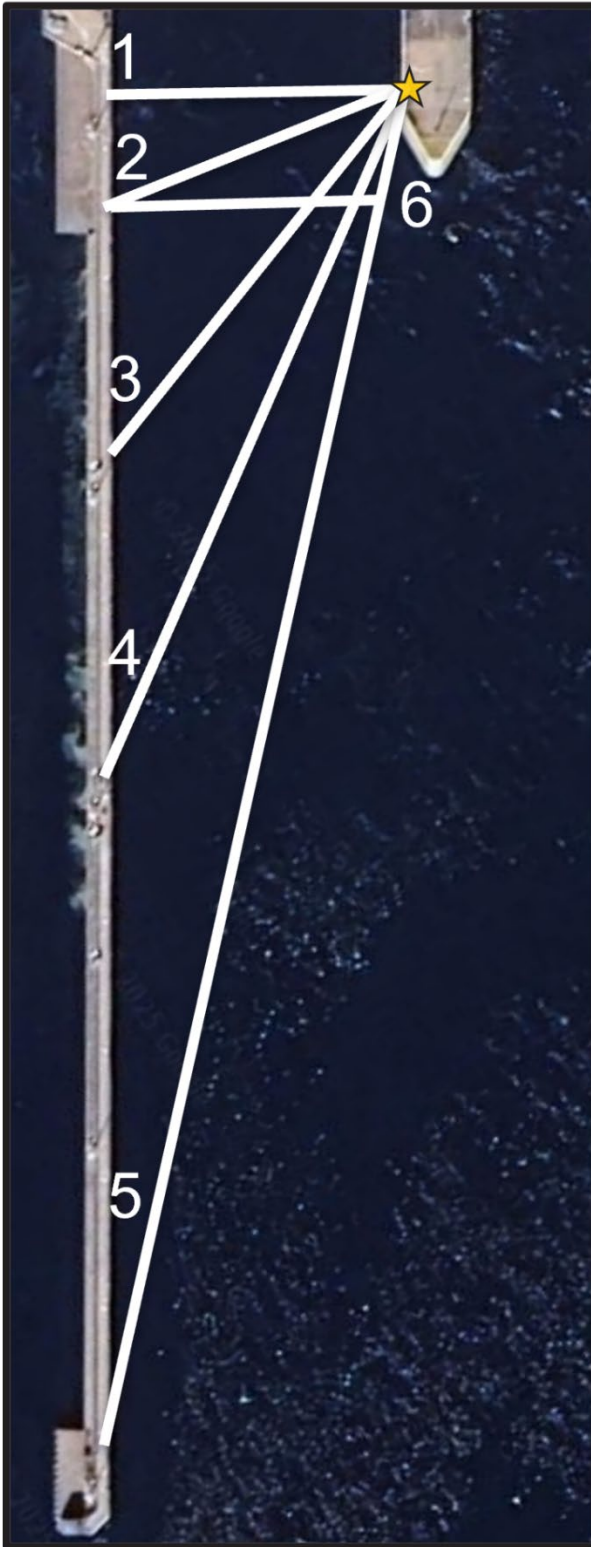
Proposed NSDS Locations at Lock and Dam No. 05. There are 5 proposed locations, with a 6th location added to reduced concrete trenching costs as the location line follows the lower lock approach concrete sill apron and then inserts at the same angle of Location No. 05. The “star” is the proposed insertion points for comparison of lengths and angles.
